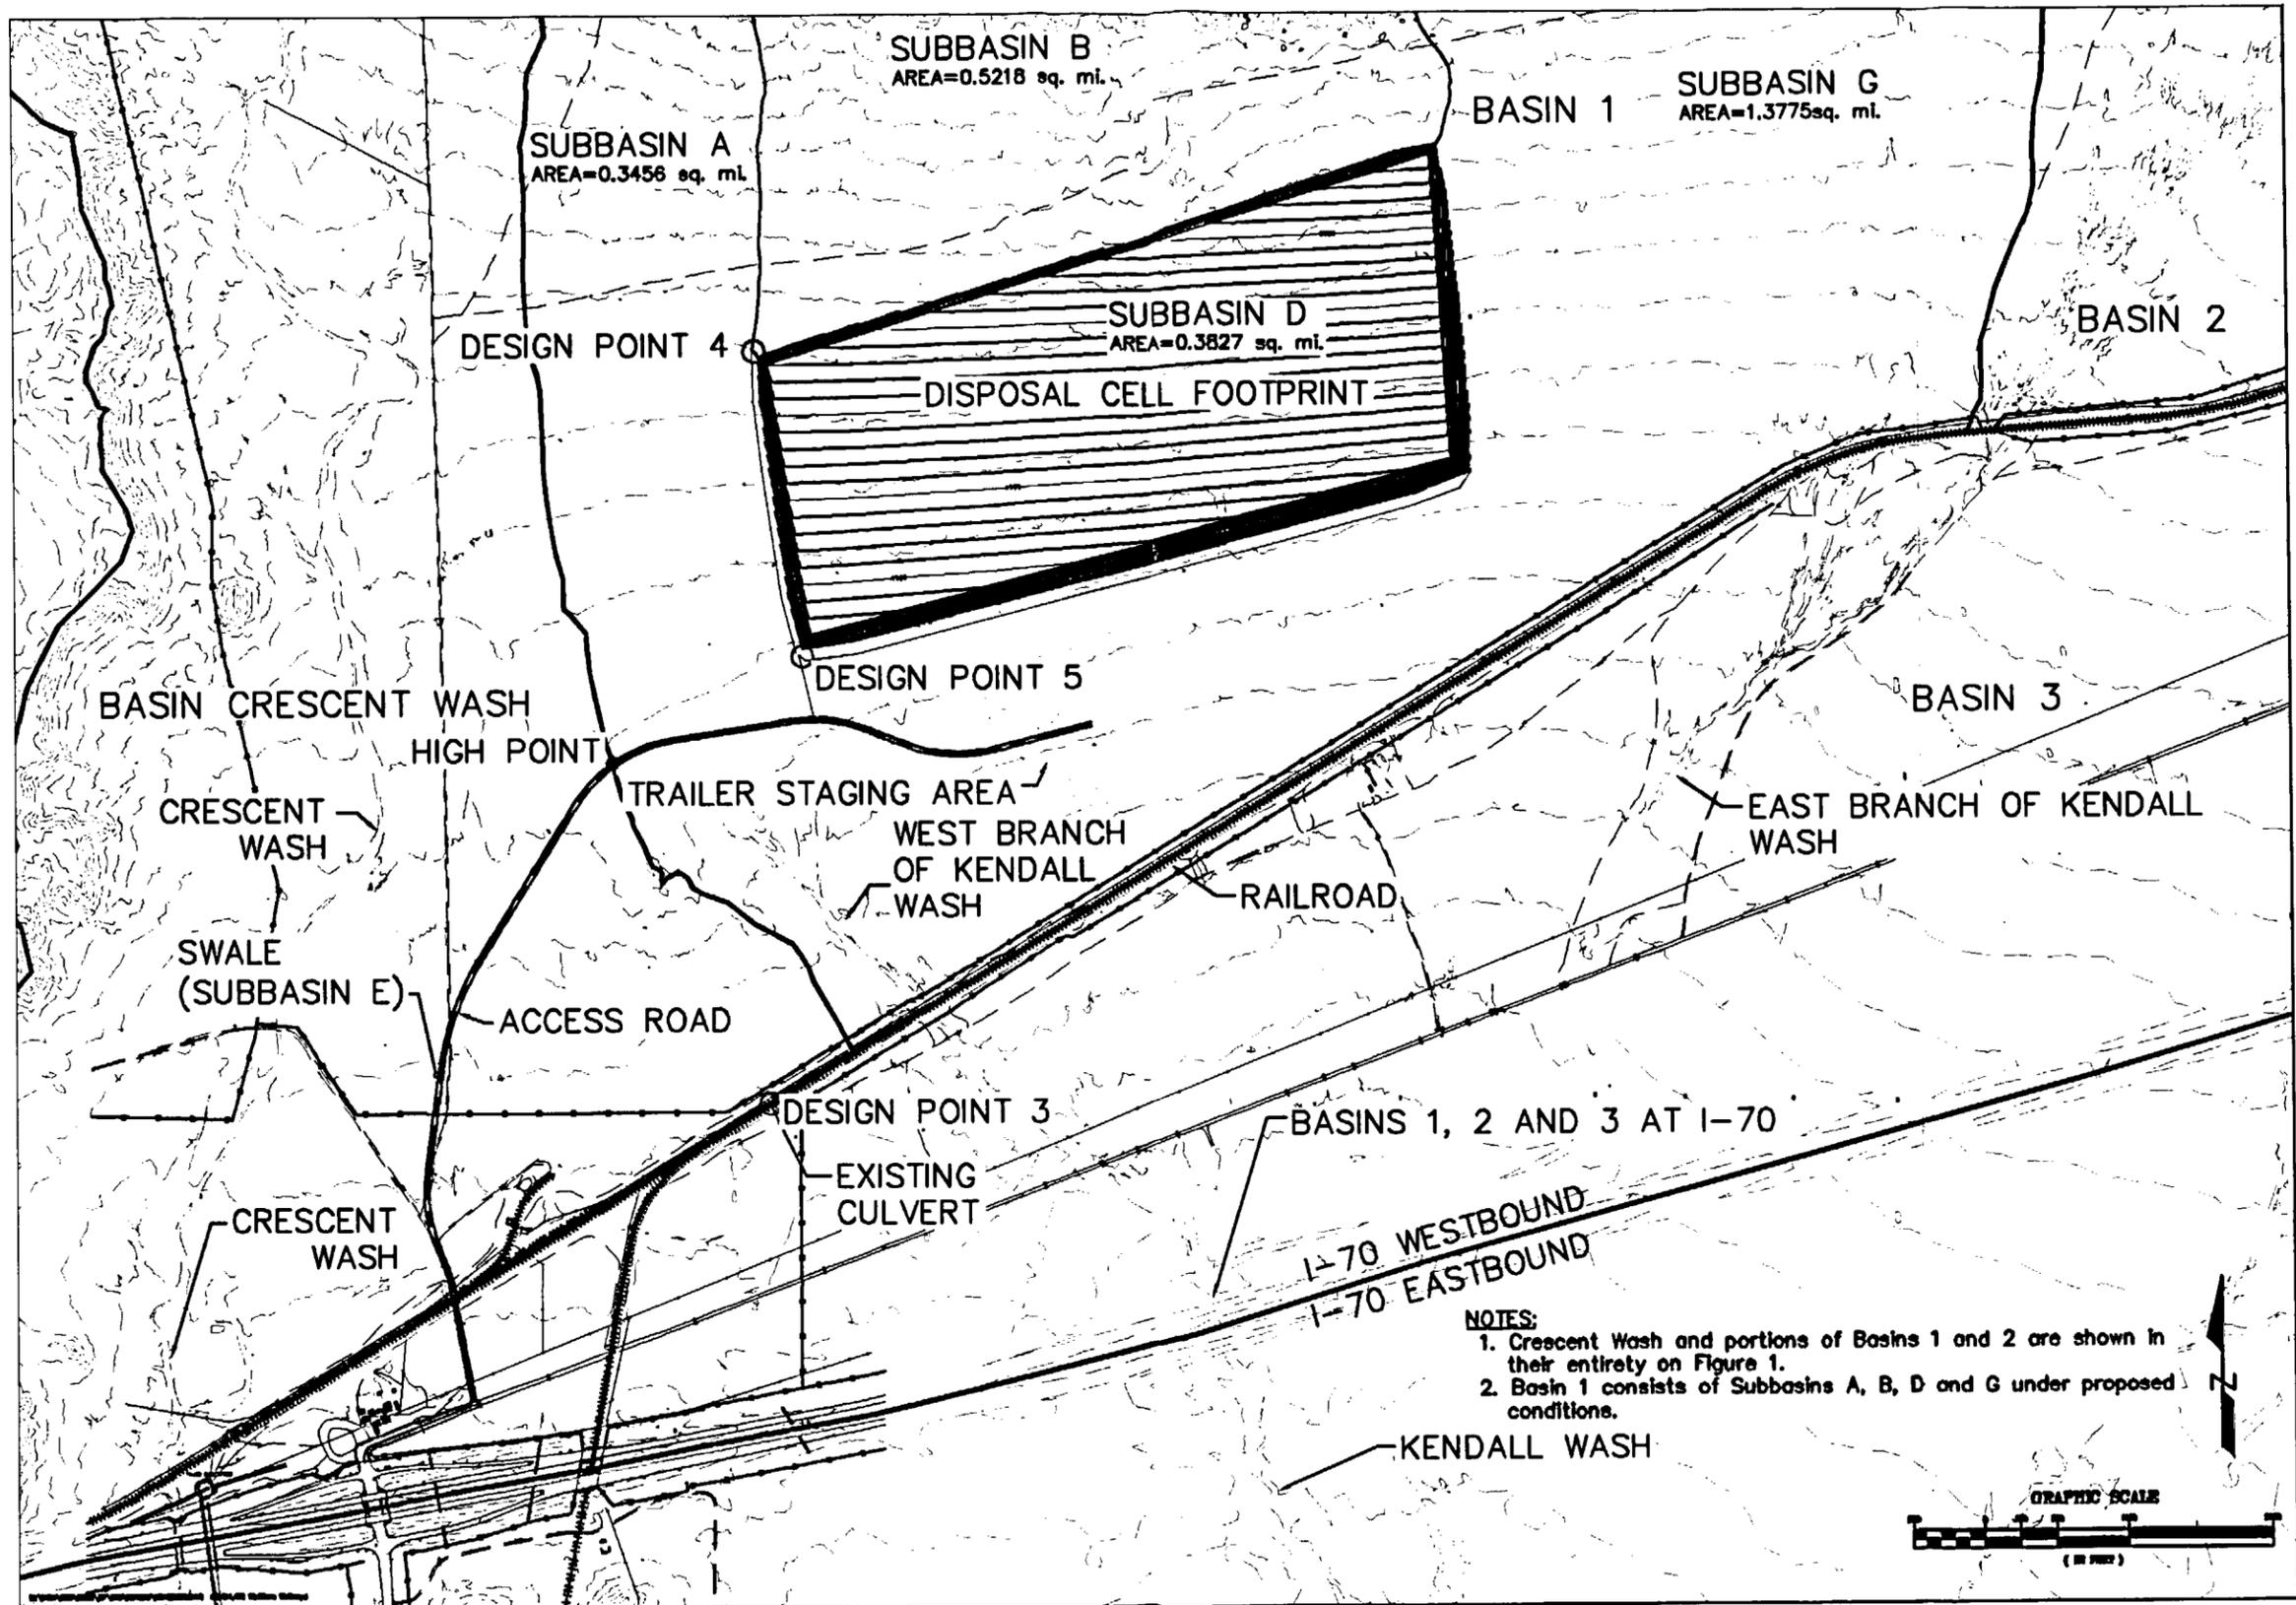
Crescent Junction Disposal Cell Site Drainage Plan
